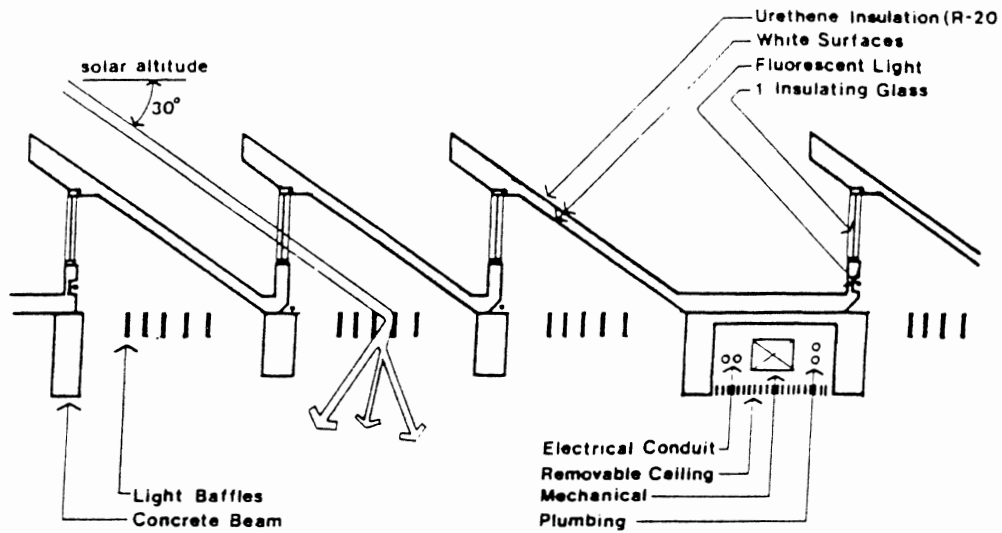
Section through roof apertures, Mt. Airy Public Library
